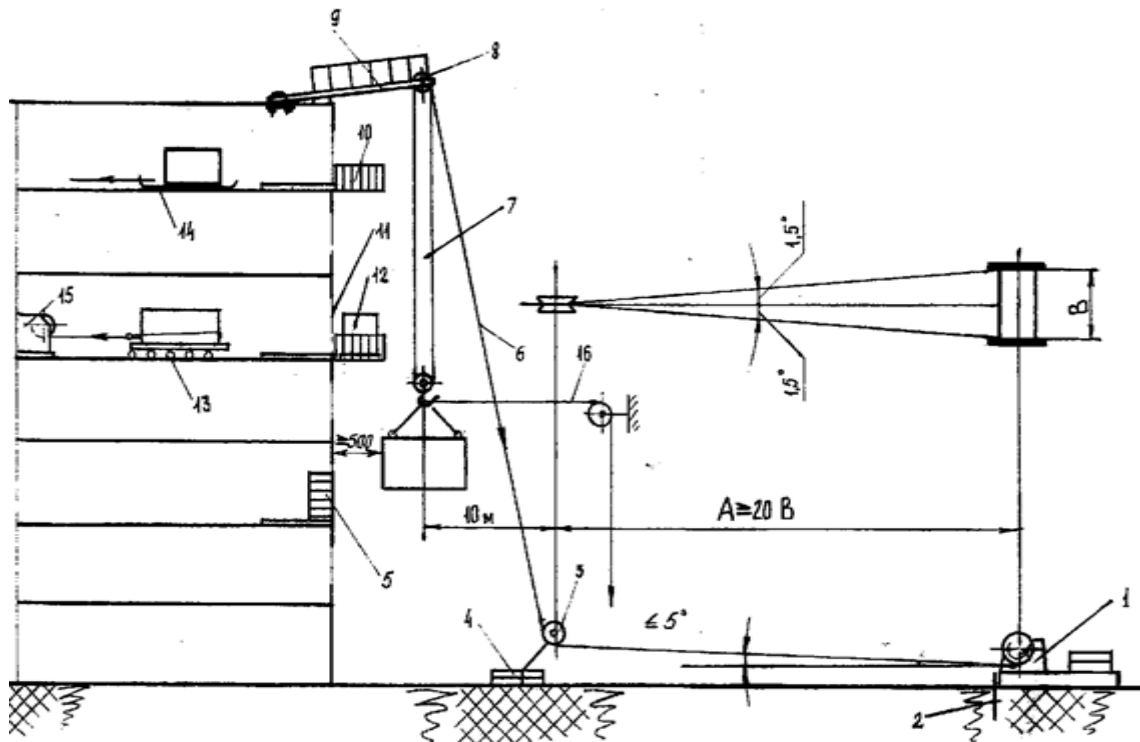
Scheme of the rigging installation: 1 – cargo winch; 2 – fuel-type anchor; 3 – outlet block; 4 – ground (ballast) type anchor; 5 – cargo receiving platform in a raised (non-working) state; 6 – descending branch of cargo rope; 7 – freight hoist; 8 – fixed block; 9 – cantilever boom; 10 – loading platform in lowered (working) condition; 11 – mounting slot; 12 – wattage at the cargo receiving platform; 13 – skating rinks; 14 – steel sheet; 15 – manual winch; 16 - brace.
